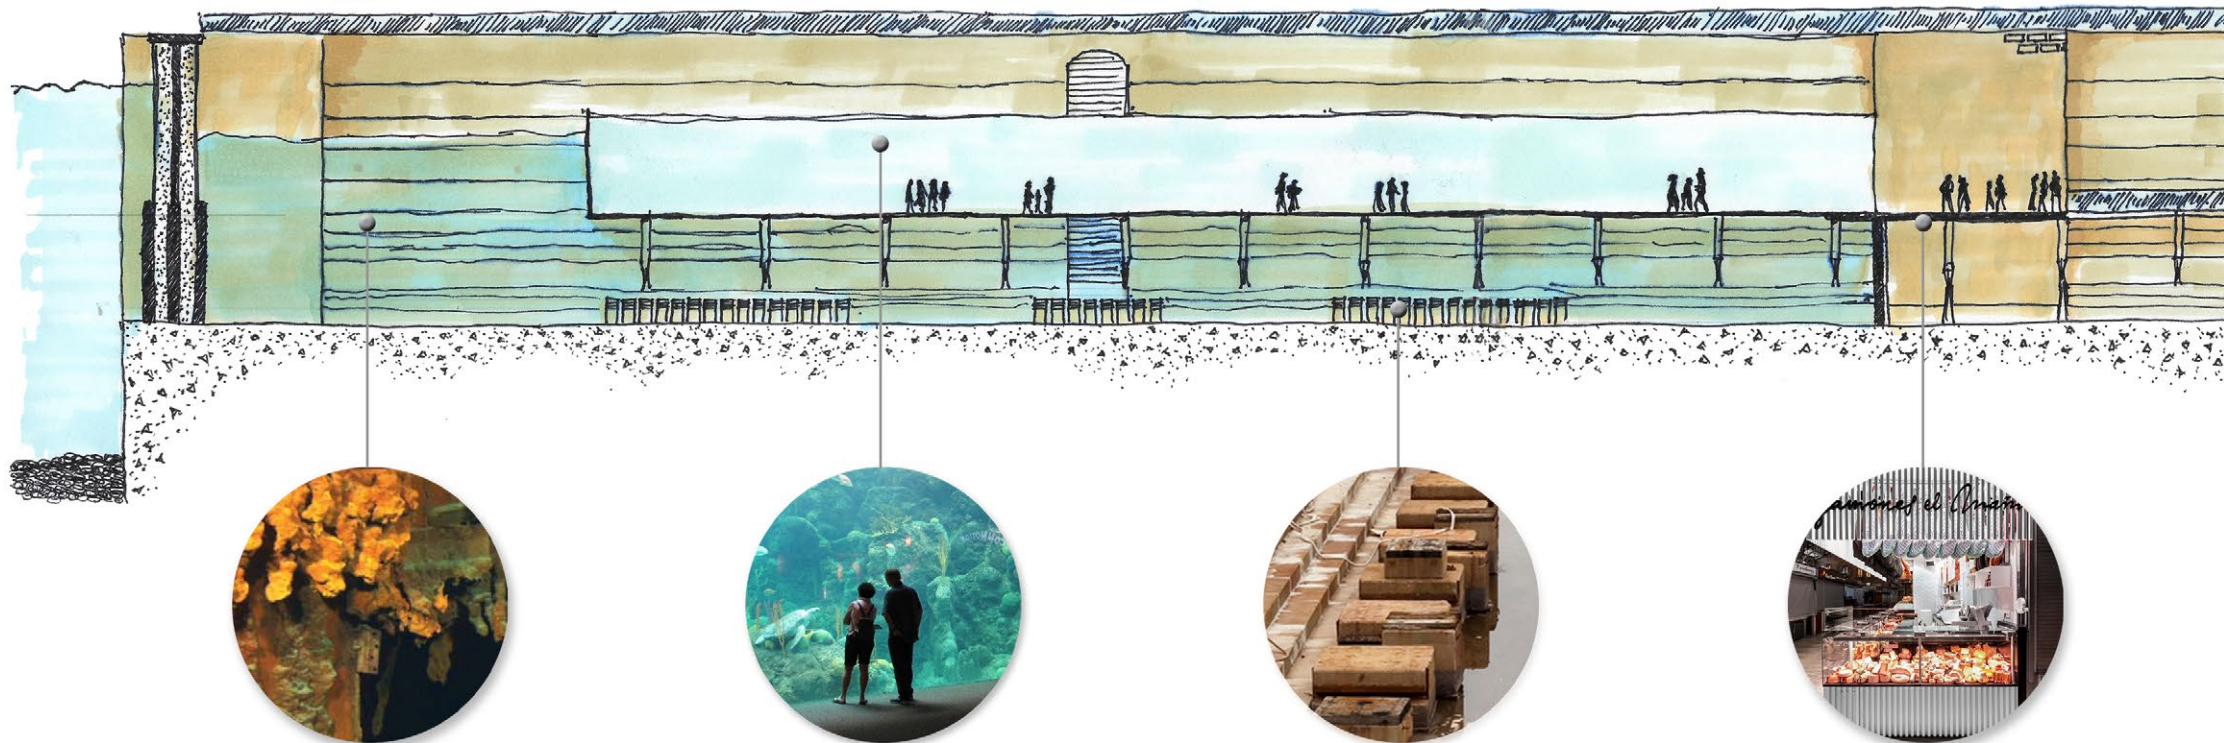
Latitudinal Section of Robinson Dry Dock (Author, 2016)
